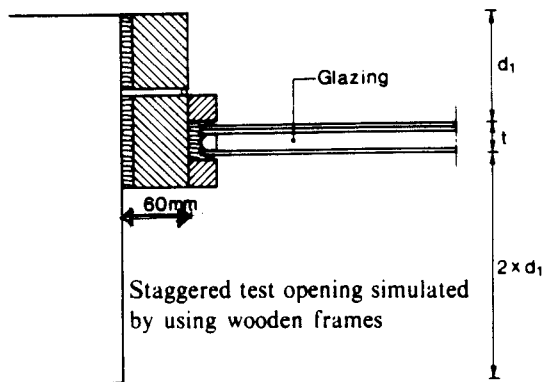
Mounting of glazing in a staggered test opening, 1,09 m × 1,09 m
